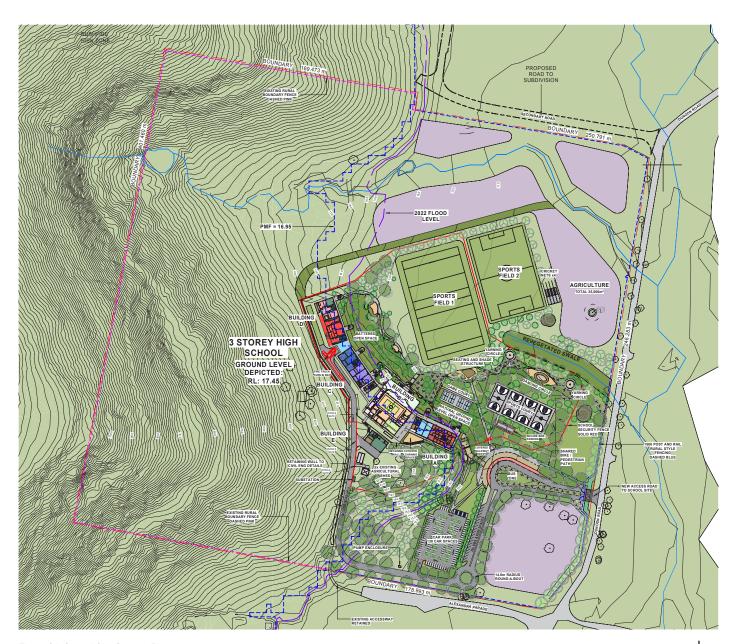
Overall Site Context Plan. Source: EJE Architects, 2025.
